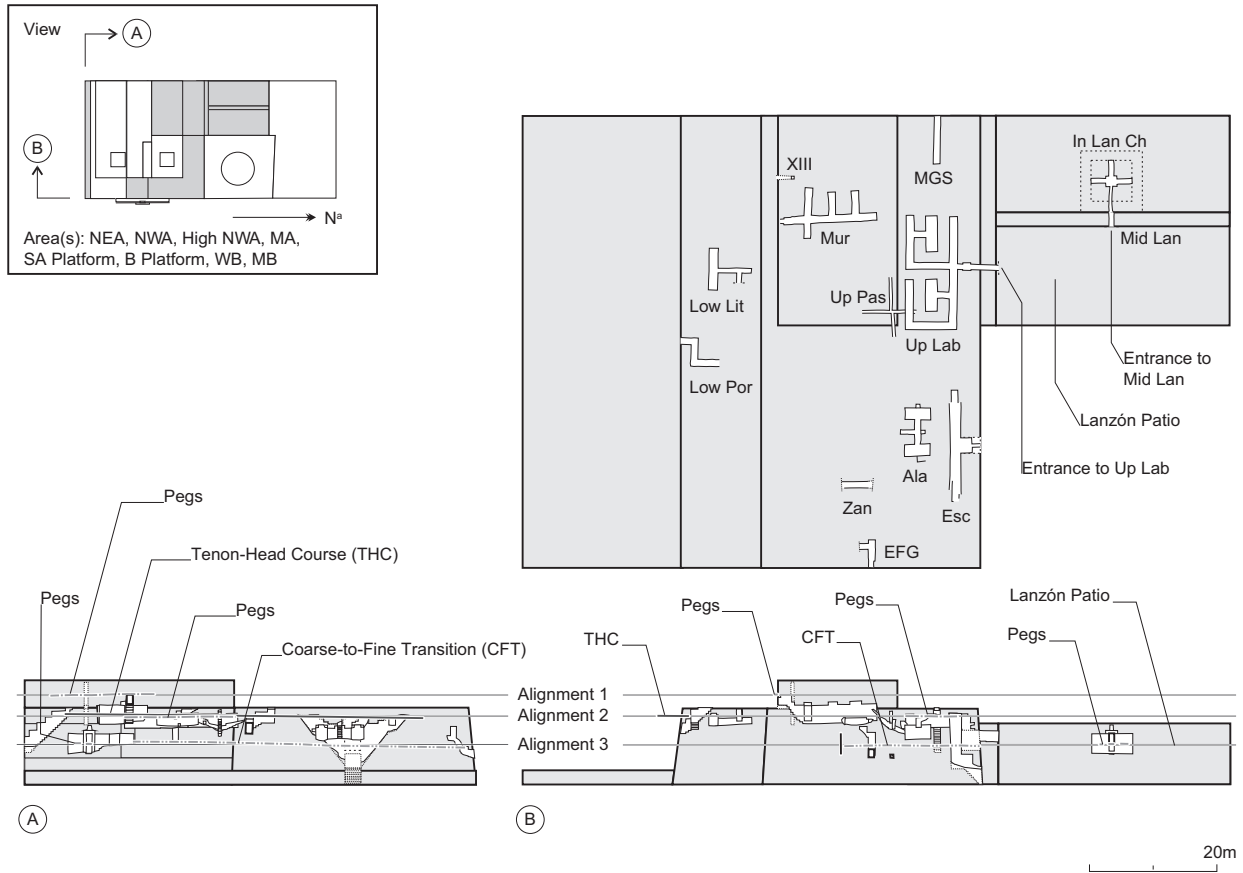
Buildings A and B during the Expansion Stage, with galleries and alignments of specific architectural features; plan and architectural north (A) and west (B) profile views. See Figure 2.27 for details of view (B).
